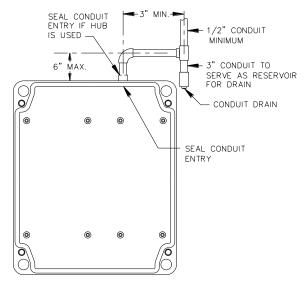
Model 247-710 & 257-710—Bottom entry conduit installation details
